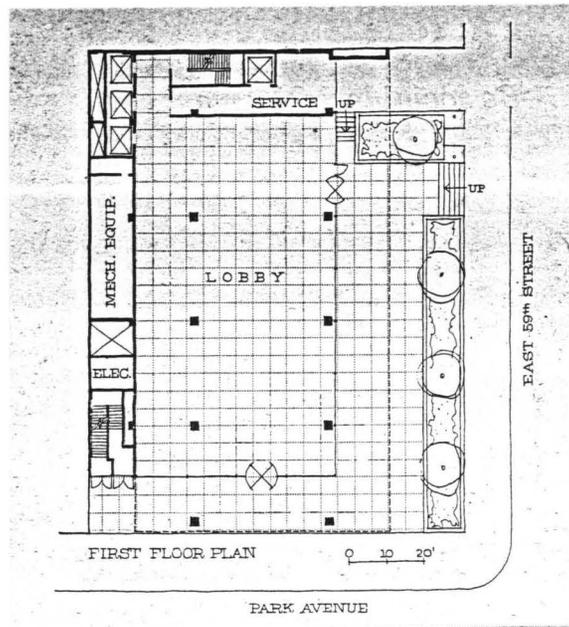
(Former) Pepsi-Cola Building, original plans
